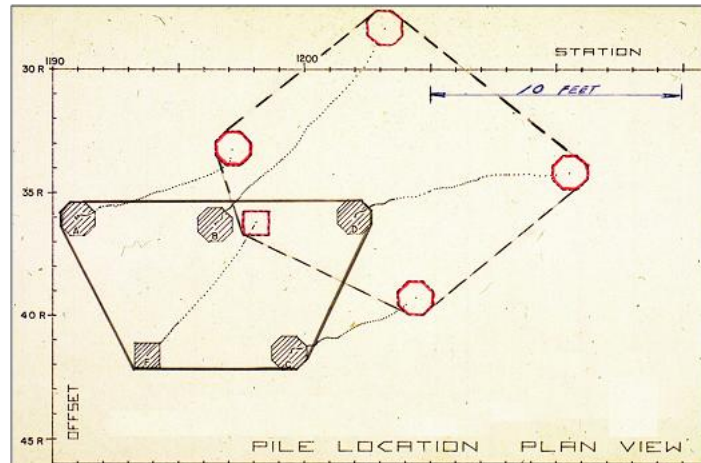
Example of deviations determined by inclinometer measurements in 60 m long prestressed piles.
